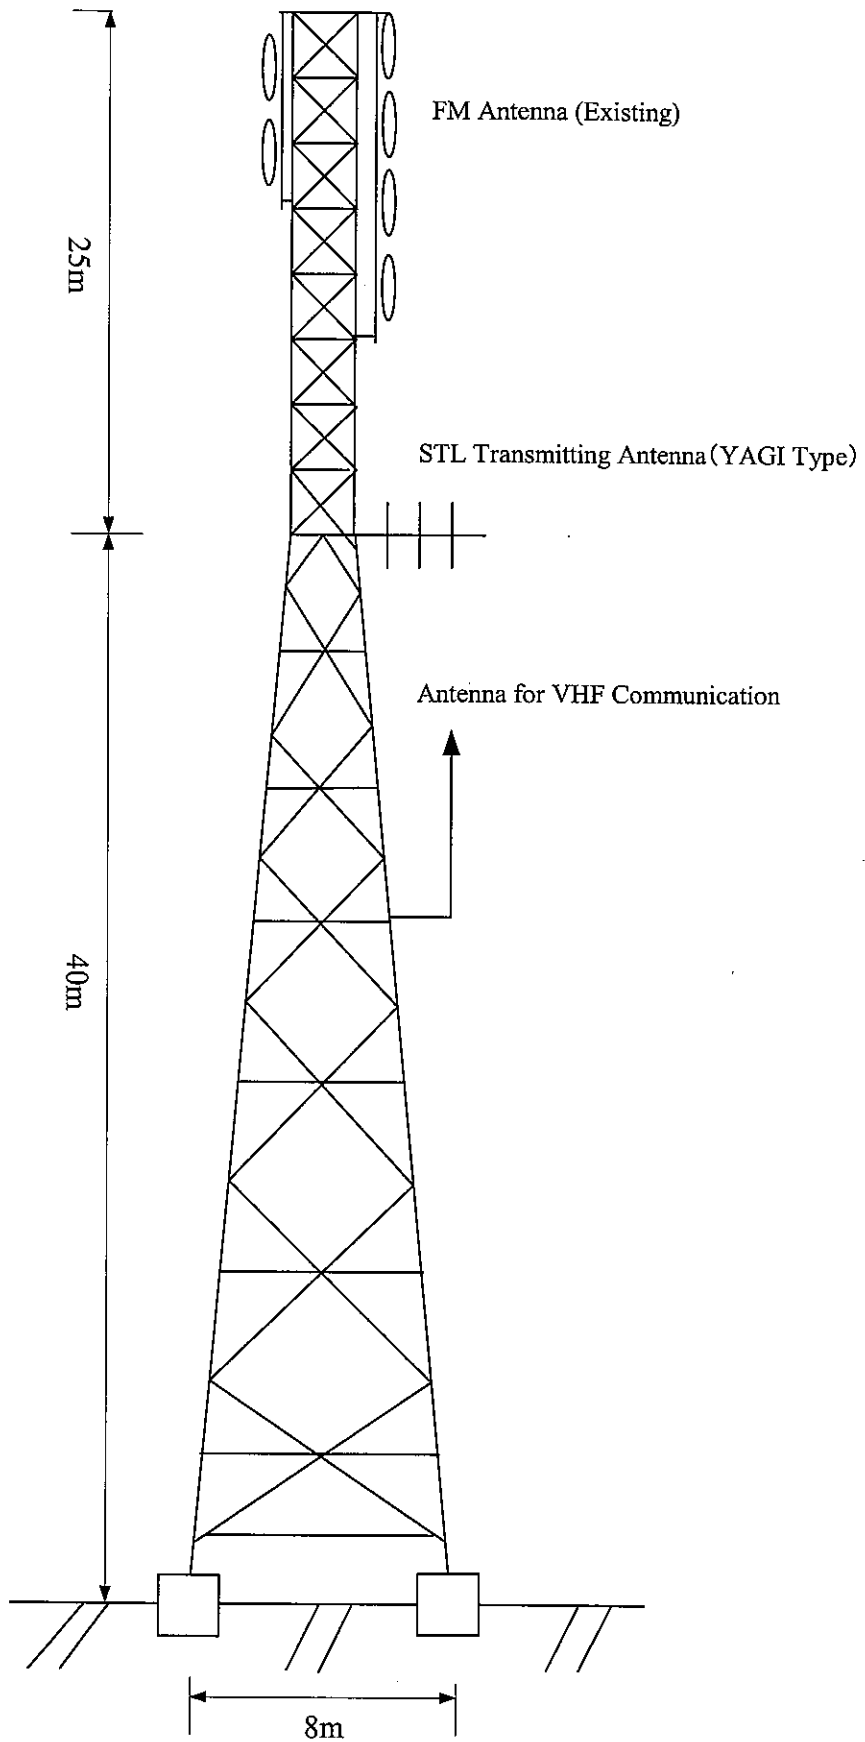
TOLI-TOLI BROADCASTING STATION	ELEVATION OF 65m SELF-SUPPORTING TOWER
